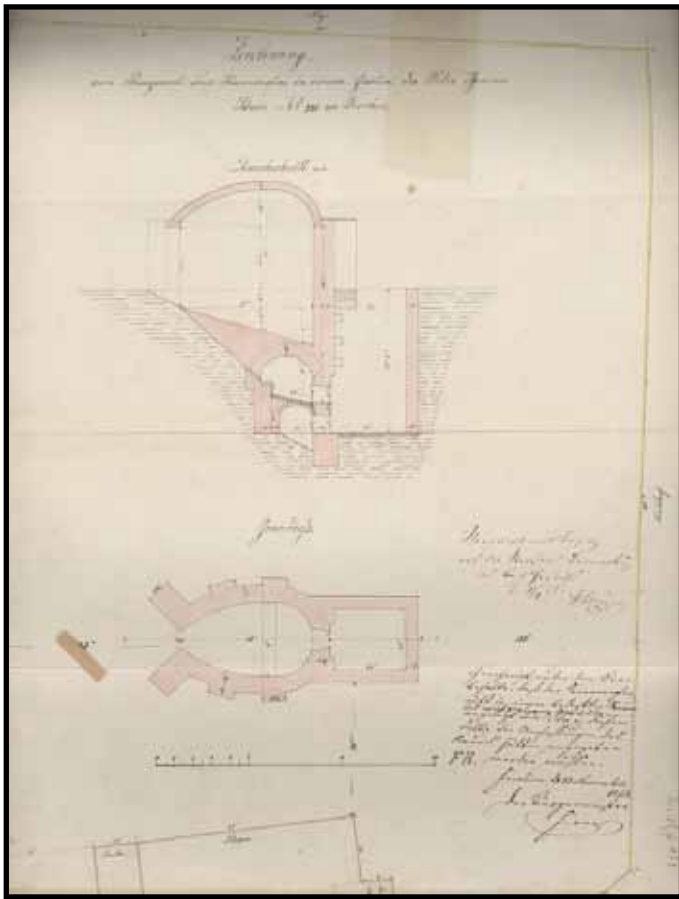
Sunken cross-draught stoneware kiln with oval ground plan and a sunken stoking-pit with vaulting under the kiln floor, Frechen type. Frechen, Nordrhein-Westfalen D, building application for the stoneware kiln of Peter Thomer, 1868 (Foto Stadtarchiv Frechen, Akte 189 Fol. 173).
